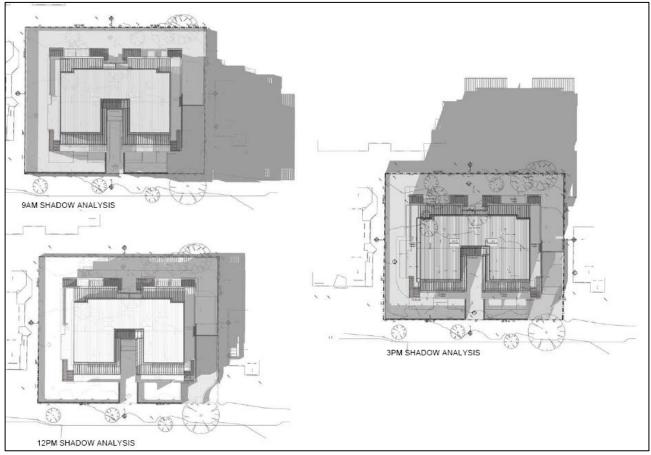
Shadow diagrams submitted as part of the original proposal prior to the deletion of the top floor as required by condition of consent.
